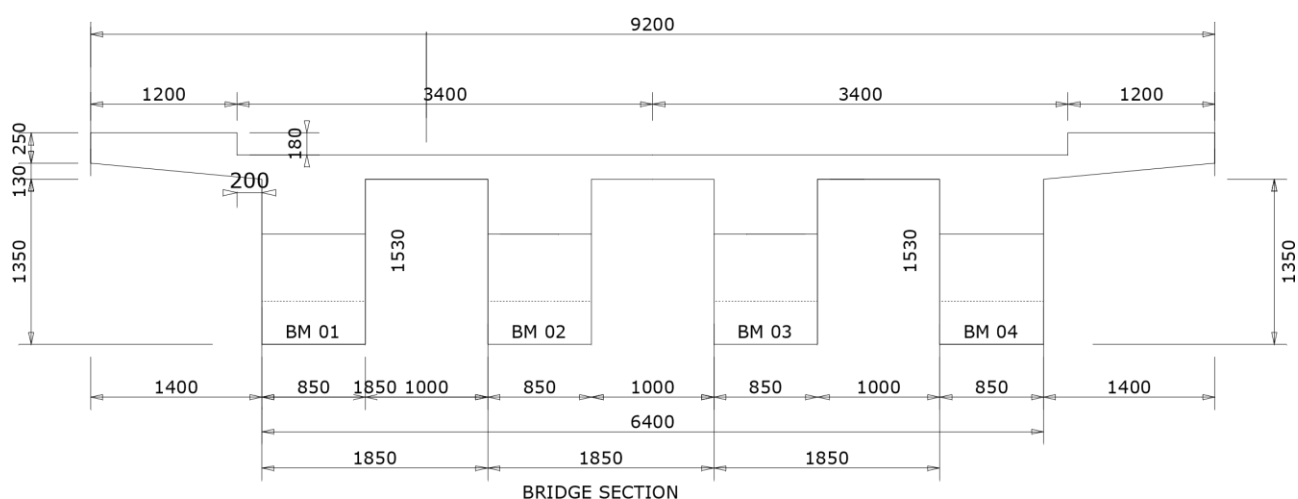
Bridge Deck Cross-Section (as built measurements during control design)
